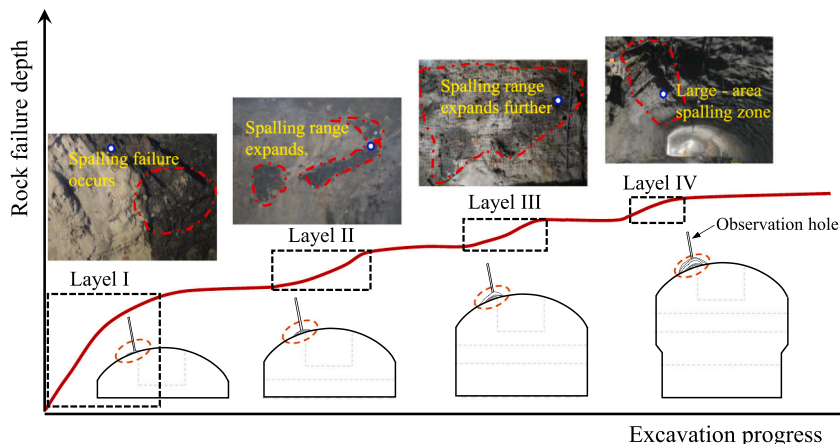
Chain-type brittle failure process under layered excavation of the large underground powerhouse at Baihetan [11,12].
